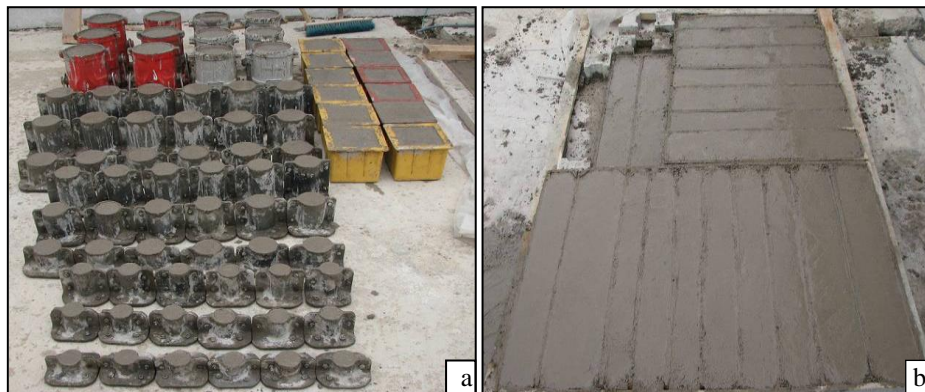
Casting concrete into formworks of specimens (a) and blocks (b) for any series
